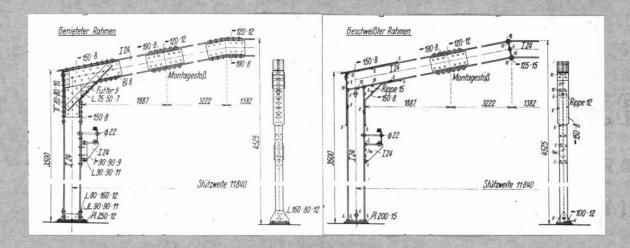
Riveted and Welded Frames For Industrial Buildings
